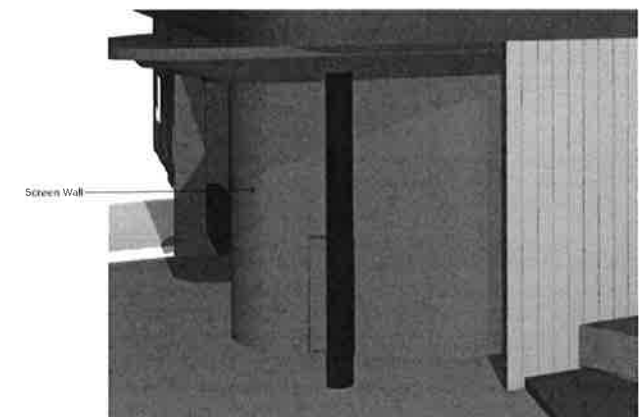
Lower ground floor plan detail indicating suggested screening for Building D
